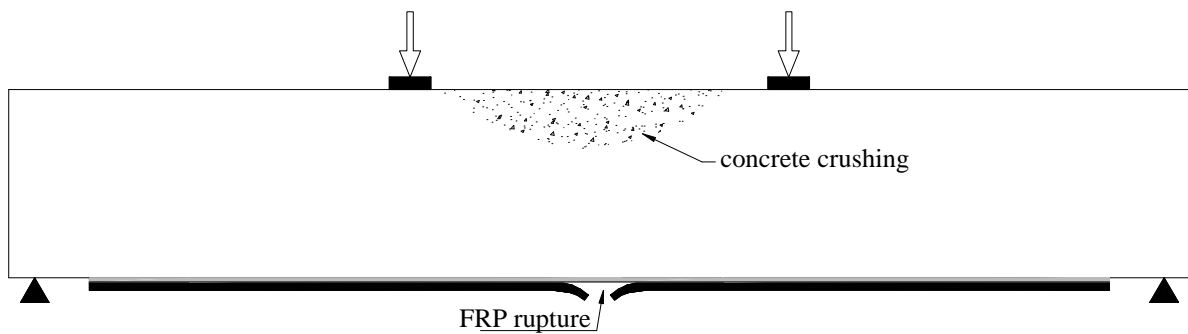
Concrete crushing and FRP rupture failure modes.
